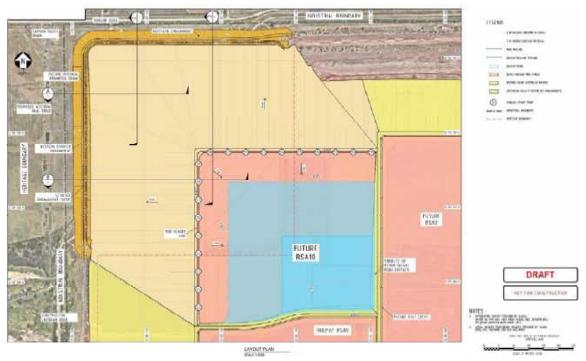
RSA10 Layout with Type Section for Stability Analysis
